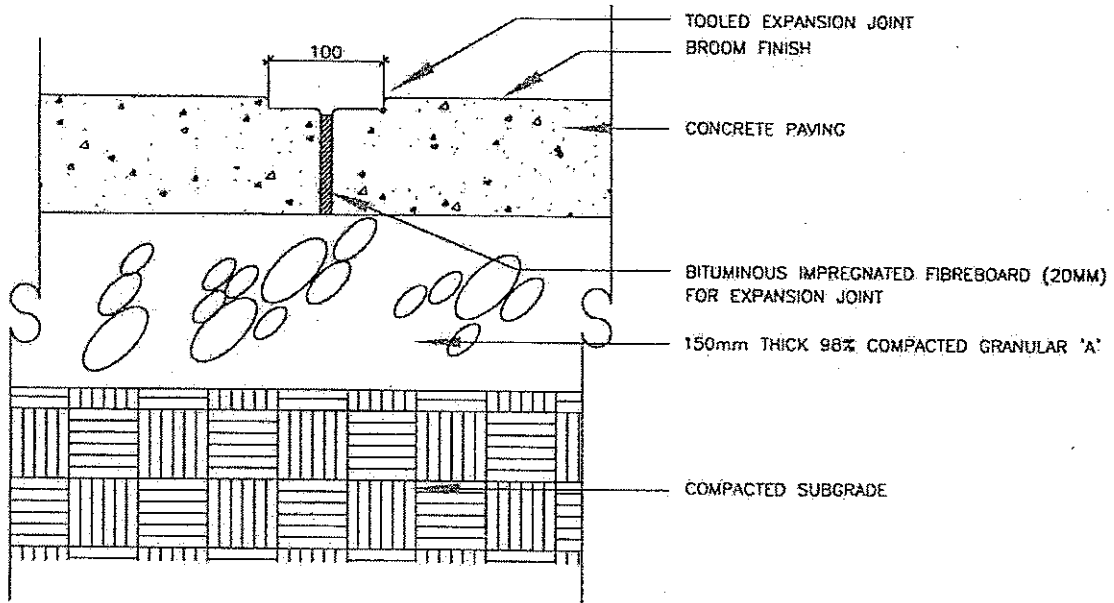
SIDEWALK CORRIDOR JOINTS IN CONCRETE
